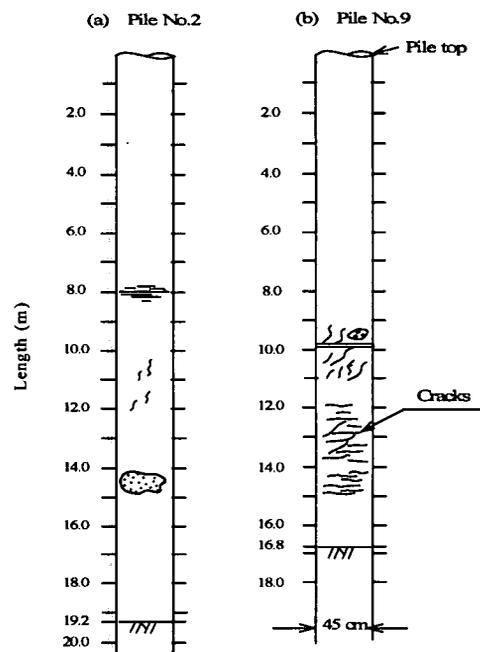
Observed damage to piles of tank TA72: (a) Pile No. 2; (b) Pile No. 9
